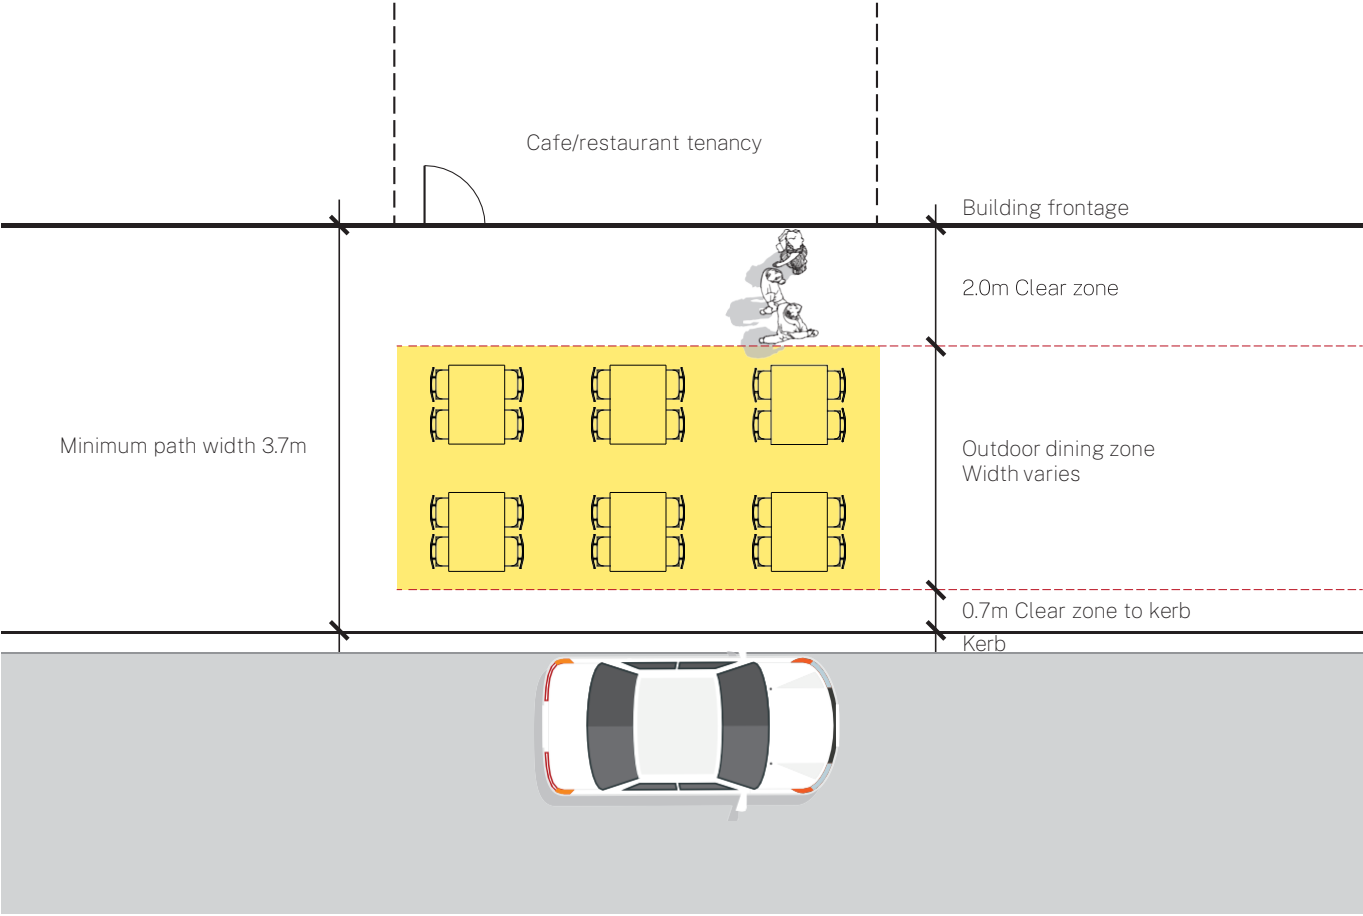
Outdoor dining area layout—for paths greater than 3.7m width
